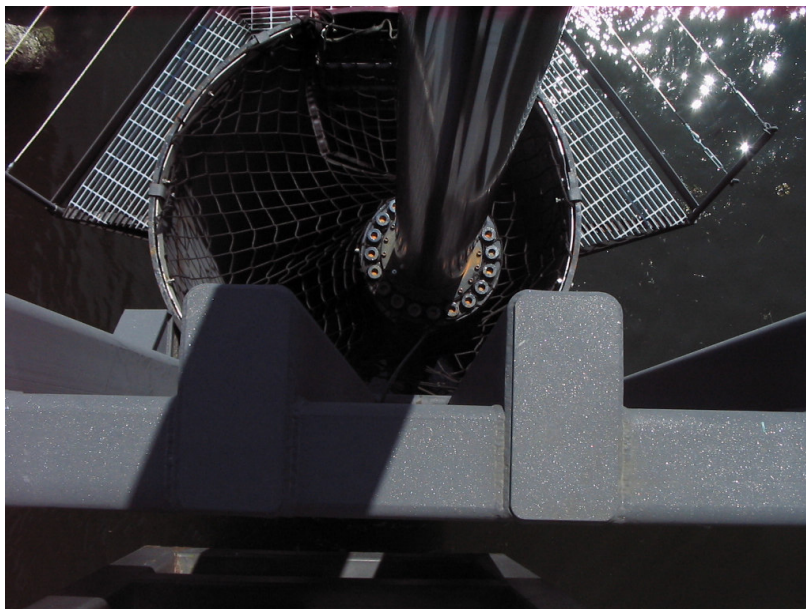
Bainbridge Ferry Terminal Lift Cylinder inside 72-inch Pile
